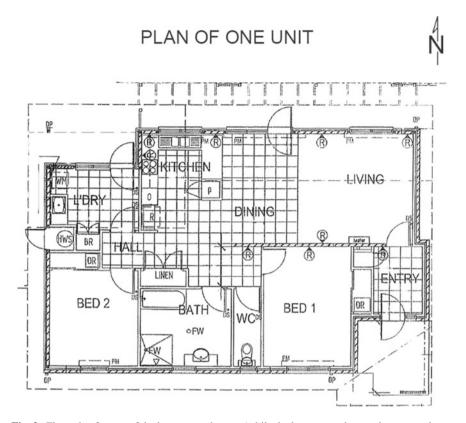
Floor plan for one of the low-energy houses (while the low-energy house plans were almost identical, there were significant differences between the layout of the control houses so no example floor plan has been included.) *Source* Department of Health and Human Services
